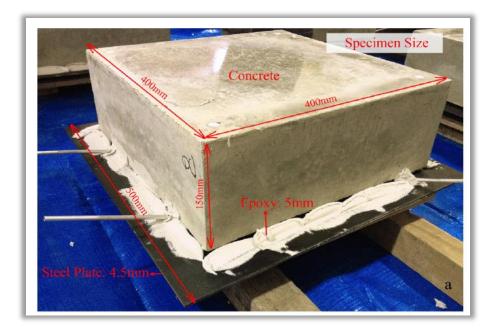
Steel-epoxy-concrete specimen Y.Shen et al. / Case studies in Nondestructive Testing and Evaluation
